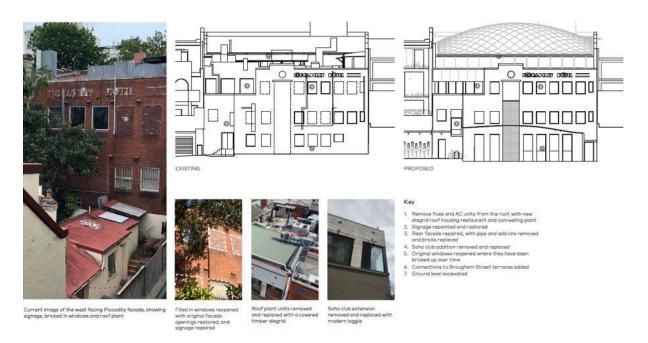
Photographic and western elevation drawing extracts of the proposed external works to the facade of the Piccadilly Hotel
